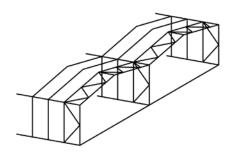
Vertical bracing in walls plus plan bracing in the roof.
